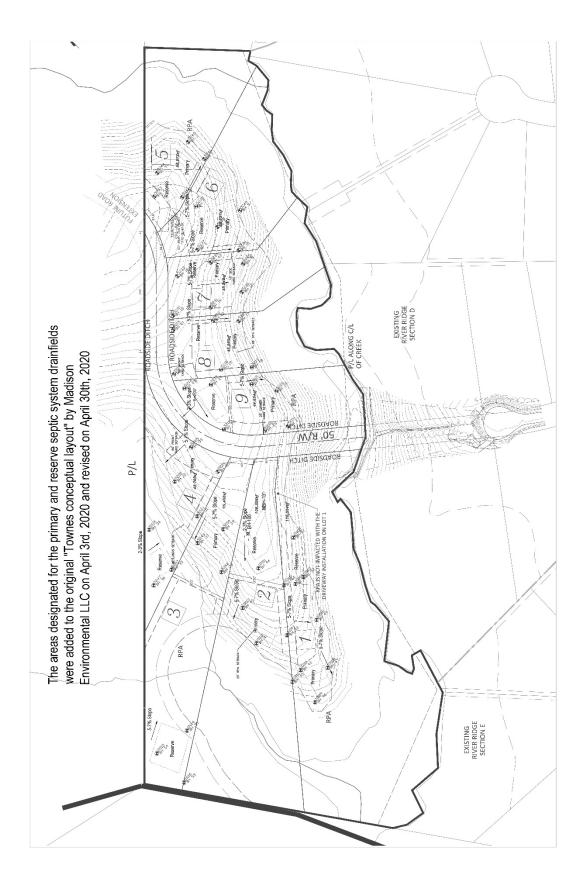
EXHIBIT B – CONCEPTUAL LAYOUT OF LOTS AND DRAINFIELDSApril 3, 2020
